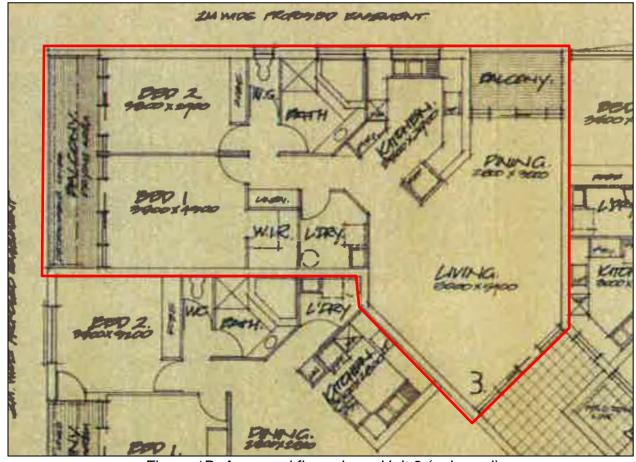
B: Approved floor plan – Unit 3 (enlarged)
